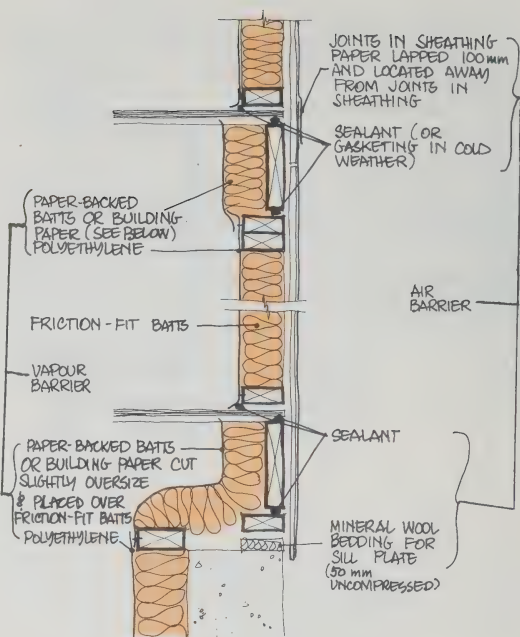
EXTERIOR WALL - FLOOR INTERSECTIONS
